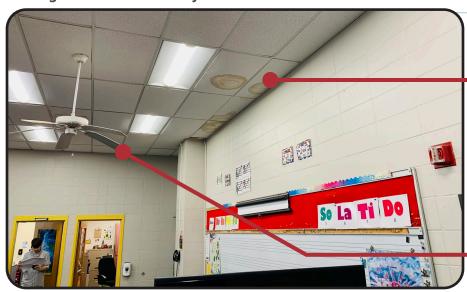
MUSIC CLASSROOM WITH CEILING TILE DAMAGE
